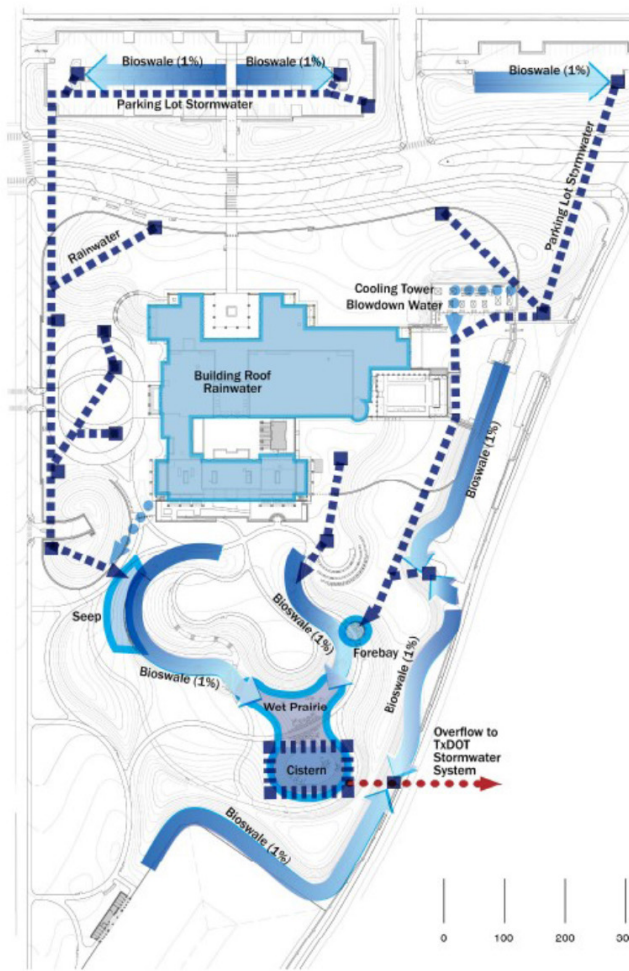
Pavement runoff at the north visitor parking lot flows to bioswales where grasses, sedges, and stone check dams cleanse the water before it is piped and released into the park's drainage features.
